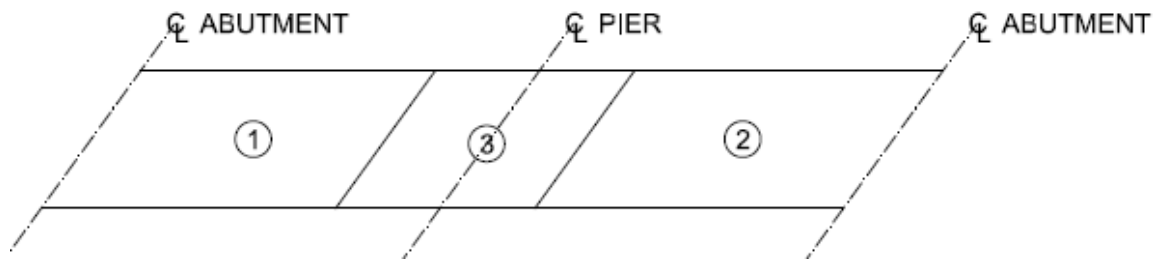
Typical sequence of casting concrete in decks for continuous-span bridges.
